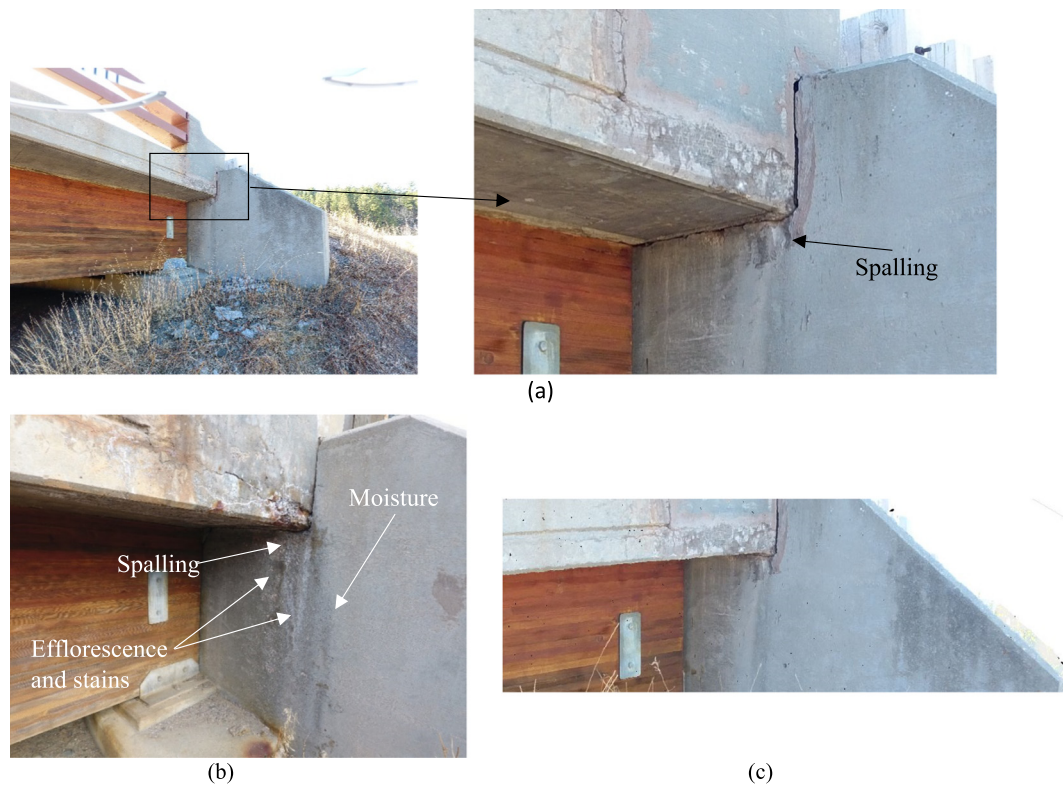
Sample abutment damage detected using drone (taken by Luis Duque): (a) Spalling on South Abutment near Girder 1; (b) spalling and discoloration of concrete caused by moisture at North Abutment near Girder 4; and (c) 3D virtual representation of South Abutment near Girder 1.
